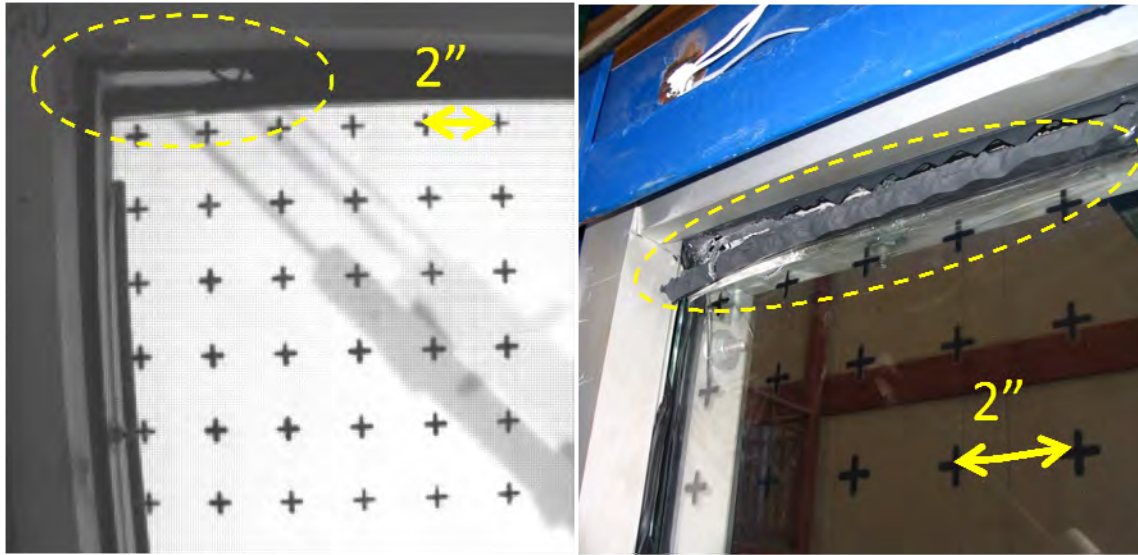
(SDS-3) Wet Glazing Attachment System detachment
